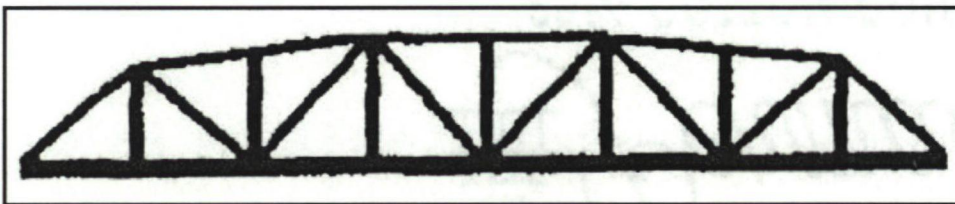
Typical elevation, polygonal top chord Warren truss⁸
